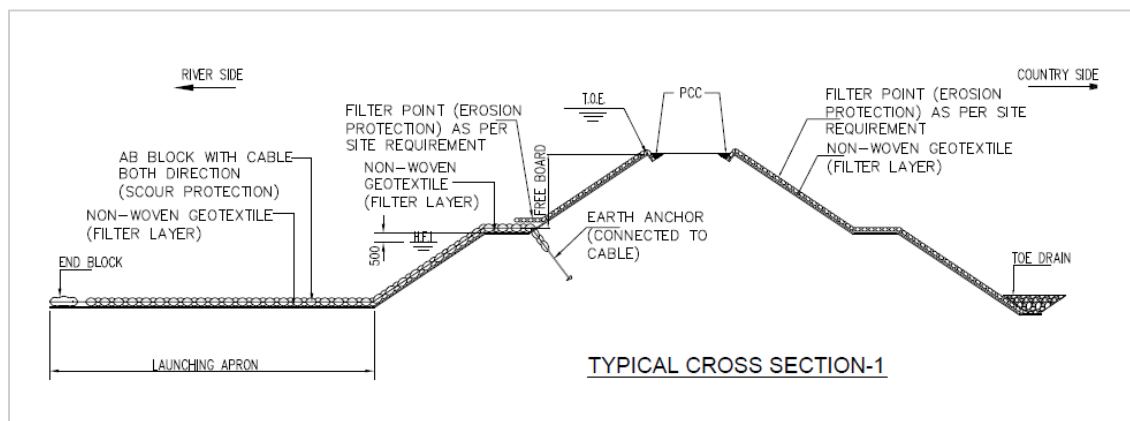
TechRevetment® Typical Cross Section proposed by Terre Armeé India
